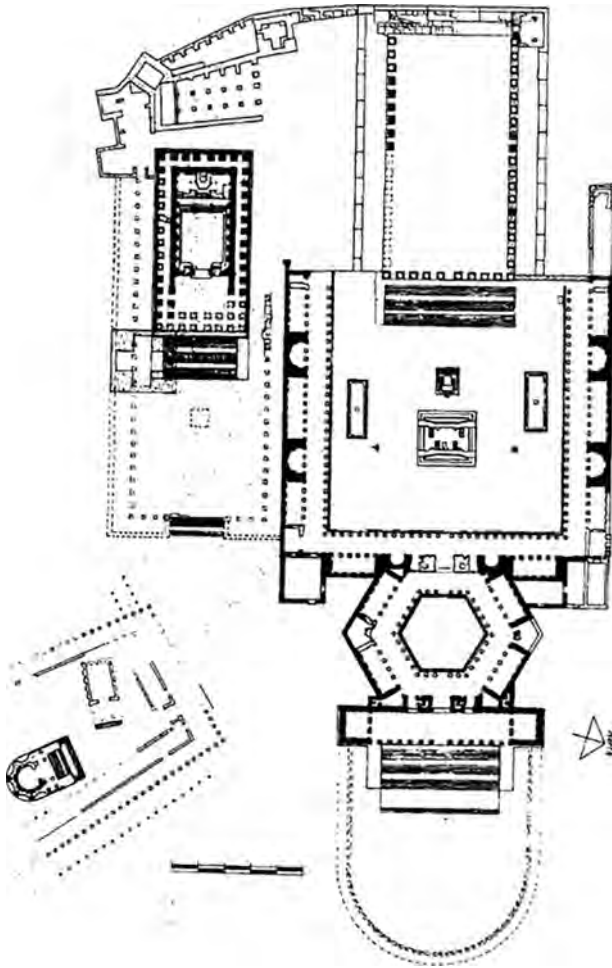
Plan of the temple complex at Baalbek (After Ragette)
